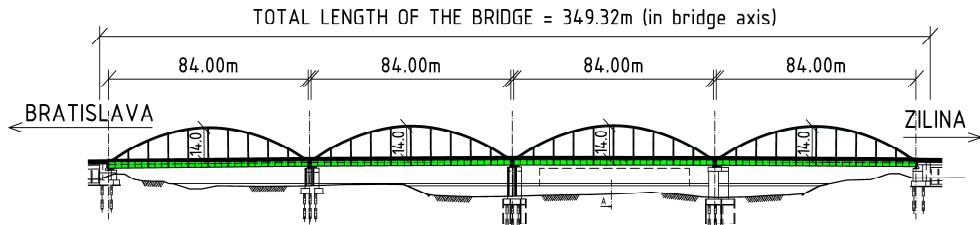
Longitudinal view of the bridge over the Nosický Water Canal.
